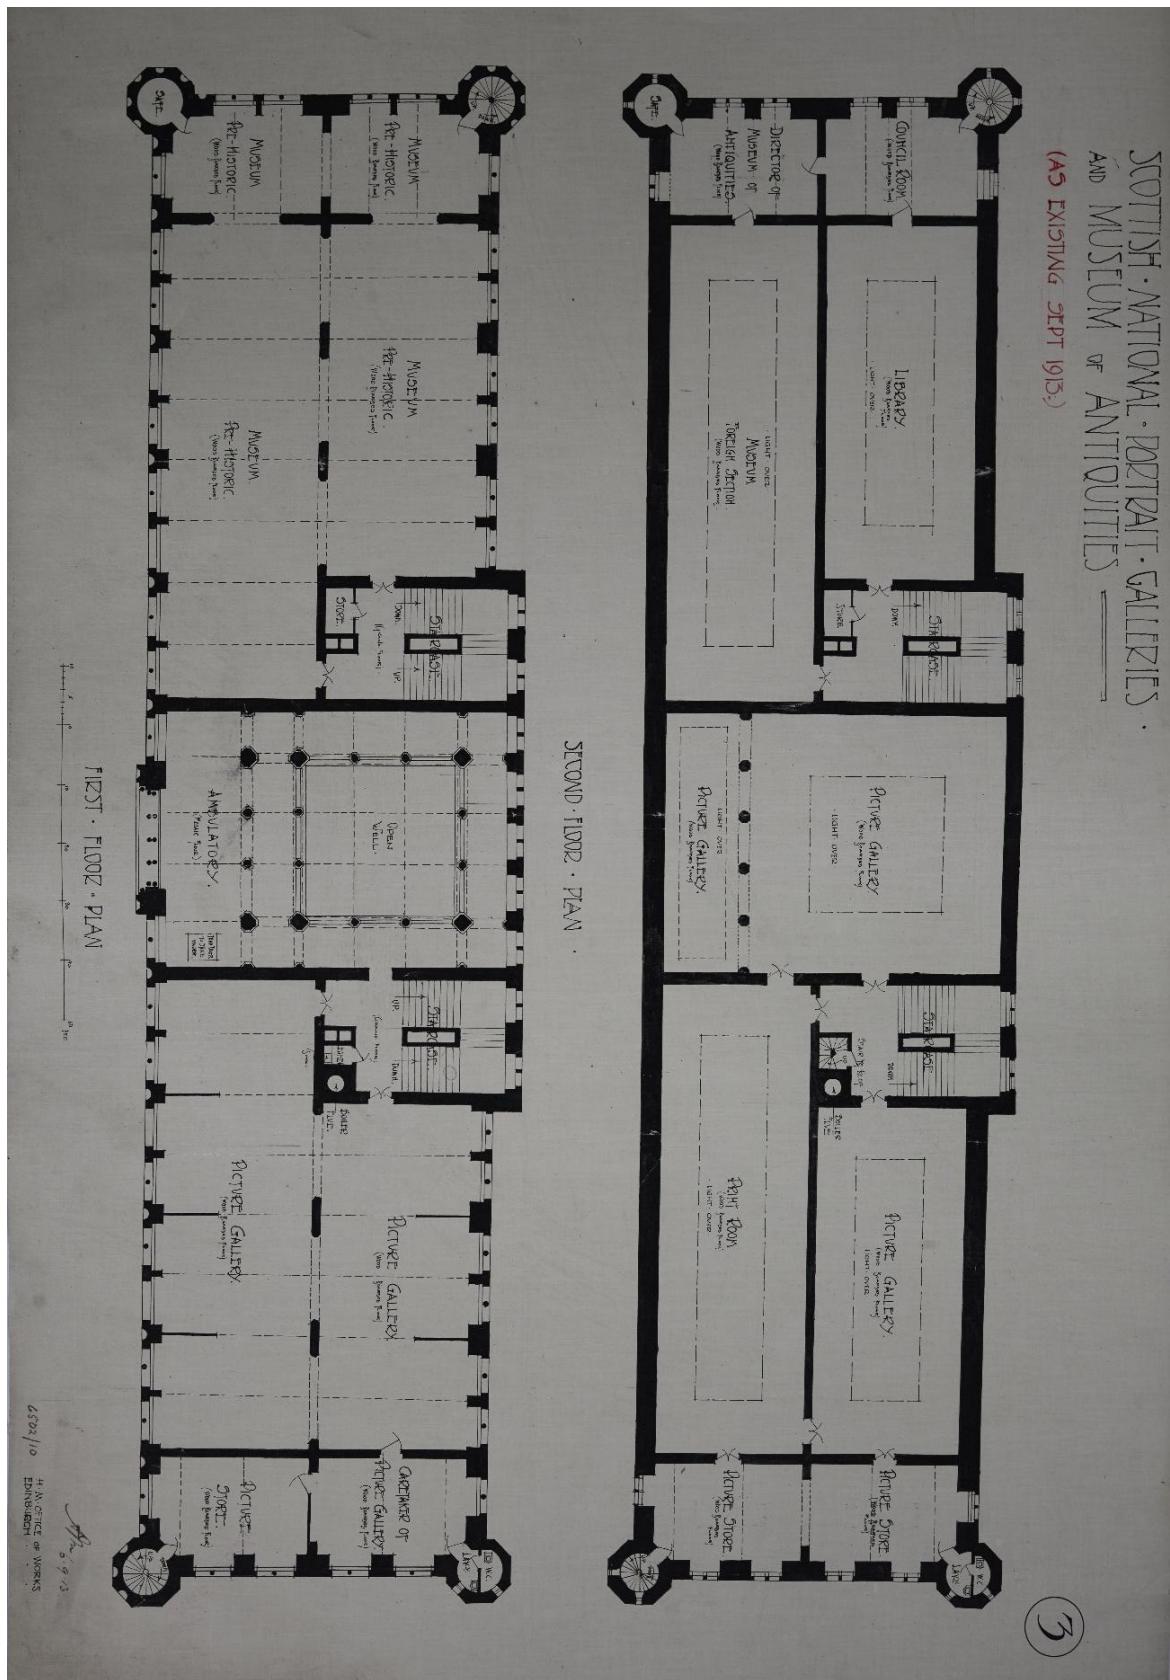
First and second floor plan, Queen Street, 1913, NRS, RHP6502/10.
